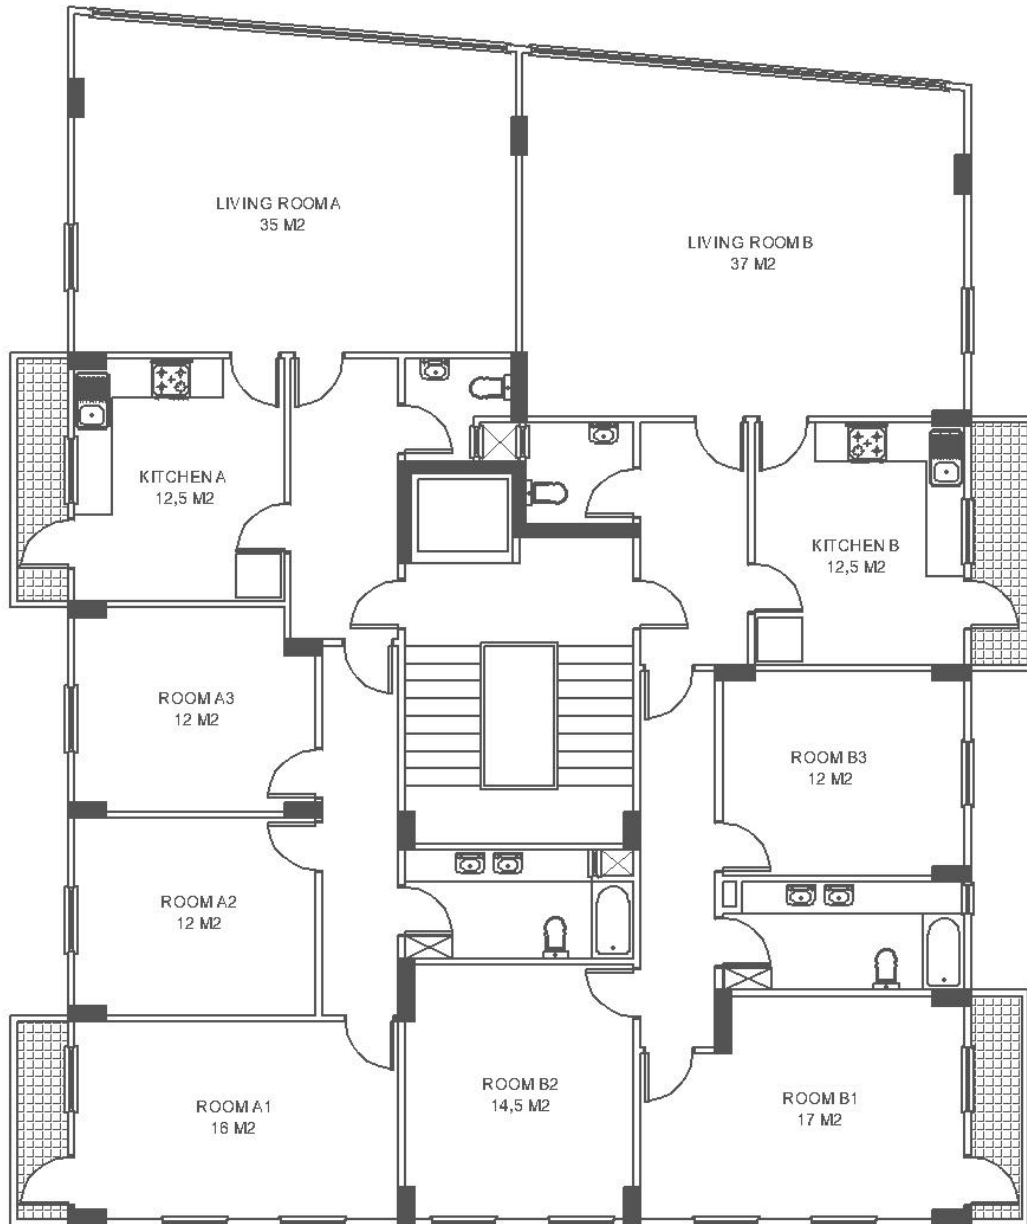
Architectural Plan of Model-1 with Irregular Structural System
